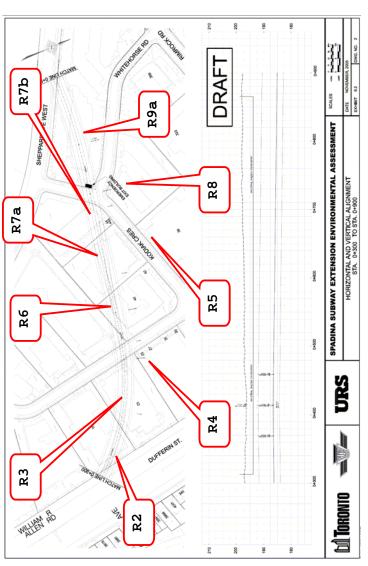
PLAN AND PROFILE OF THE PROPOSED SUBWAY ALIGNMENT
